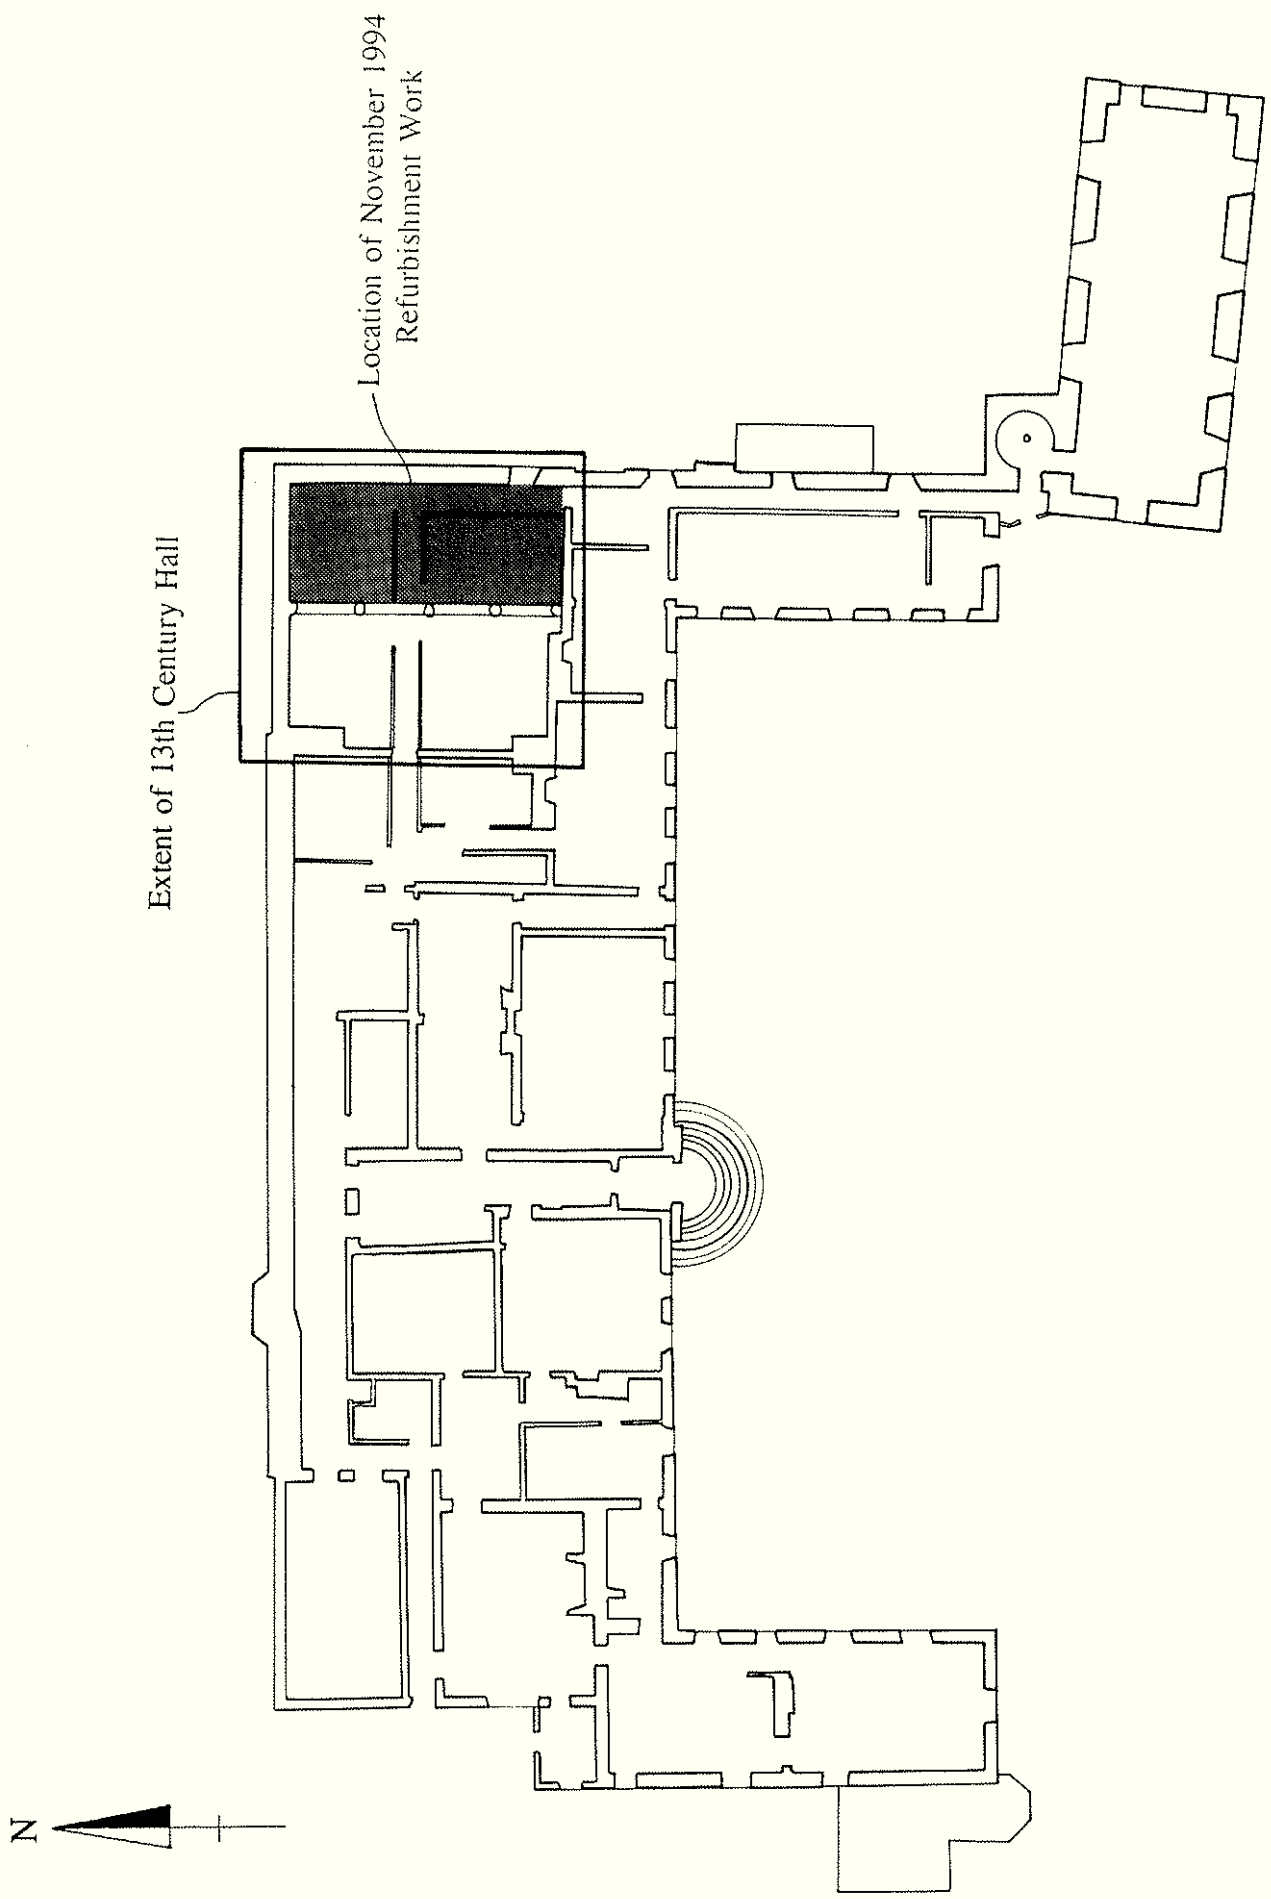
Stonor Park: Block Plan showing Location of Refurbishment Work.
